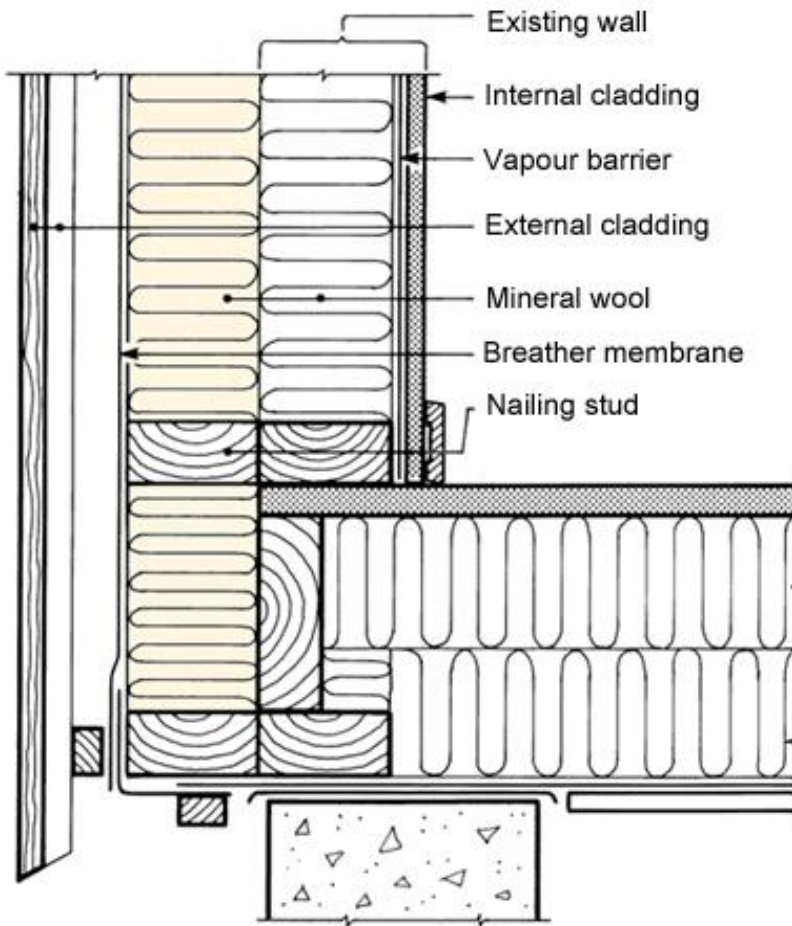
External insulation (light yellow) added to the wall of a load bearing wood structure (Hole 2004).
